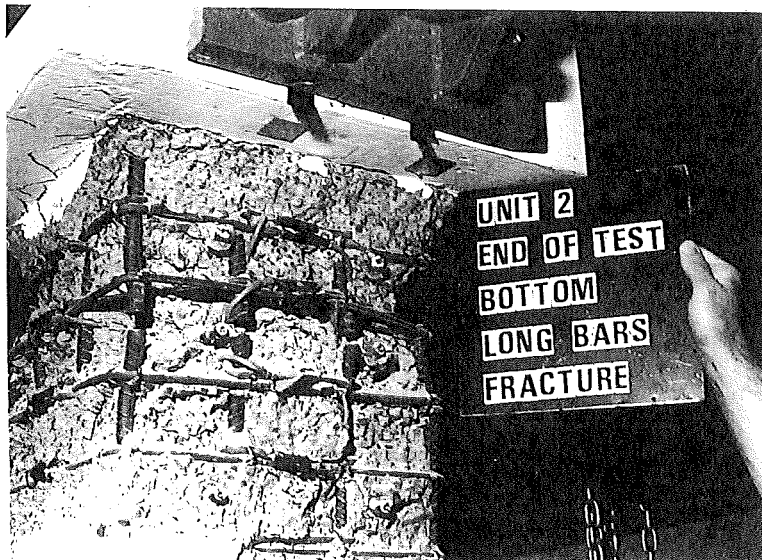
LONGITUDINAL BARS FRACTURED AT THE END OF THE TESTING
